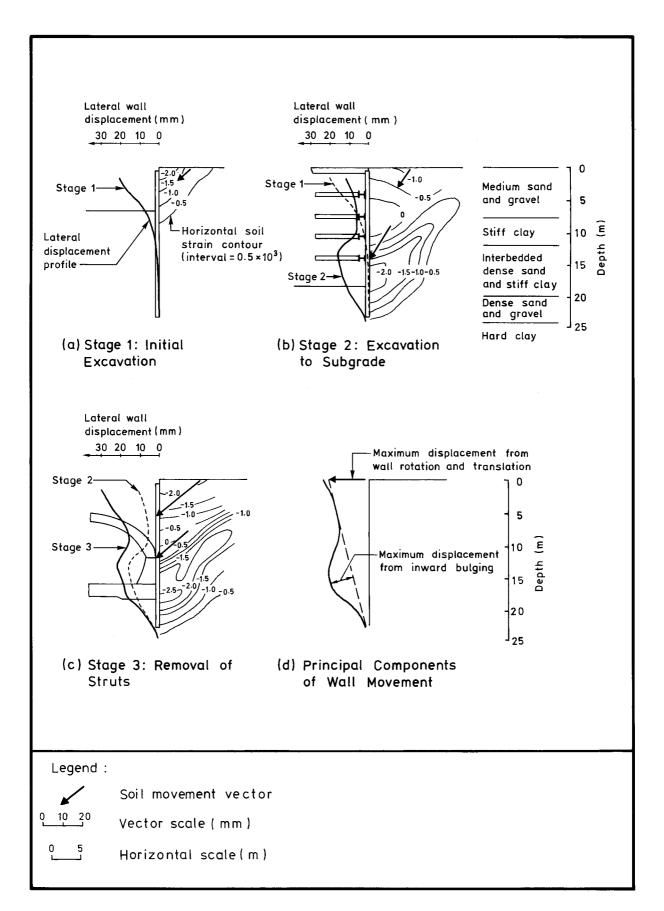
Horizontal Strains Associated with Various Stages of Strutted Excavation Construction (O'Rourke, 1981)
